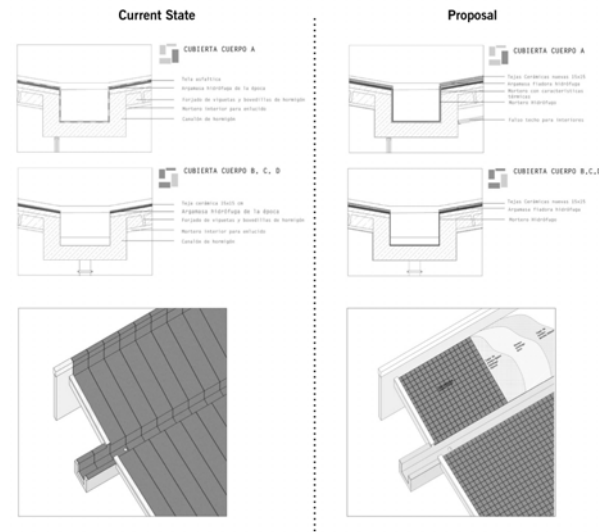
Market's pavilions roofs details current state and repair proposal.
